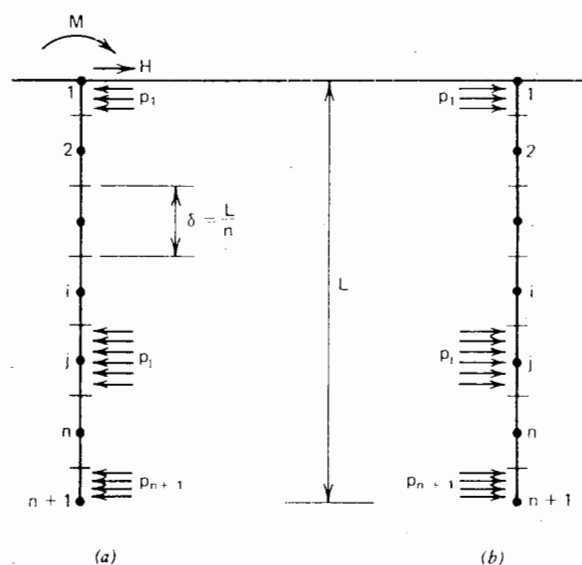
Floating pile. Stresses acting on (a) pile; (b) soil adjacent to pile.
